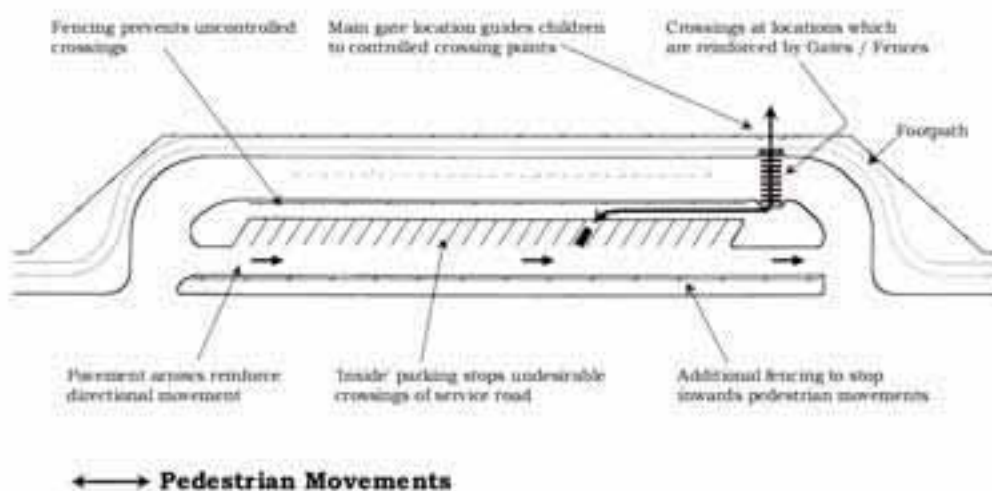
A PICK-UP AND SET-DOWN FACILITY
